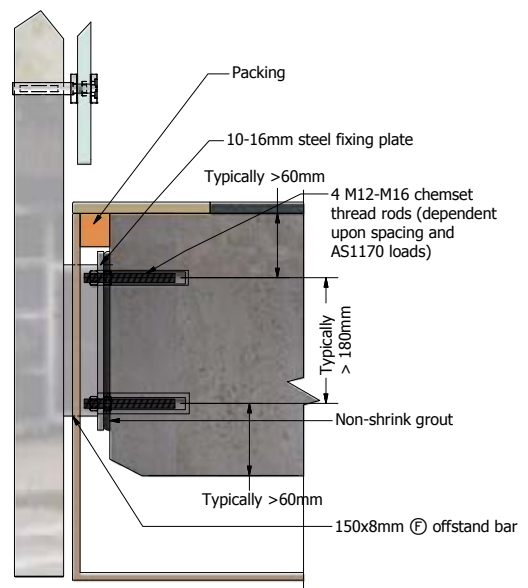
Thick concrete fixing detail. Slotted cylindrical stand-off stanchion connections fulfill a structural role and achieve a satisfactory geometric design detail. Glass panels mounted on the handrail-side of the stanchion and handrail supported by through-glass patch fittings.
